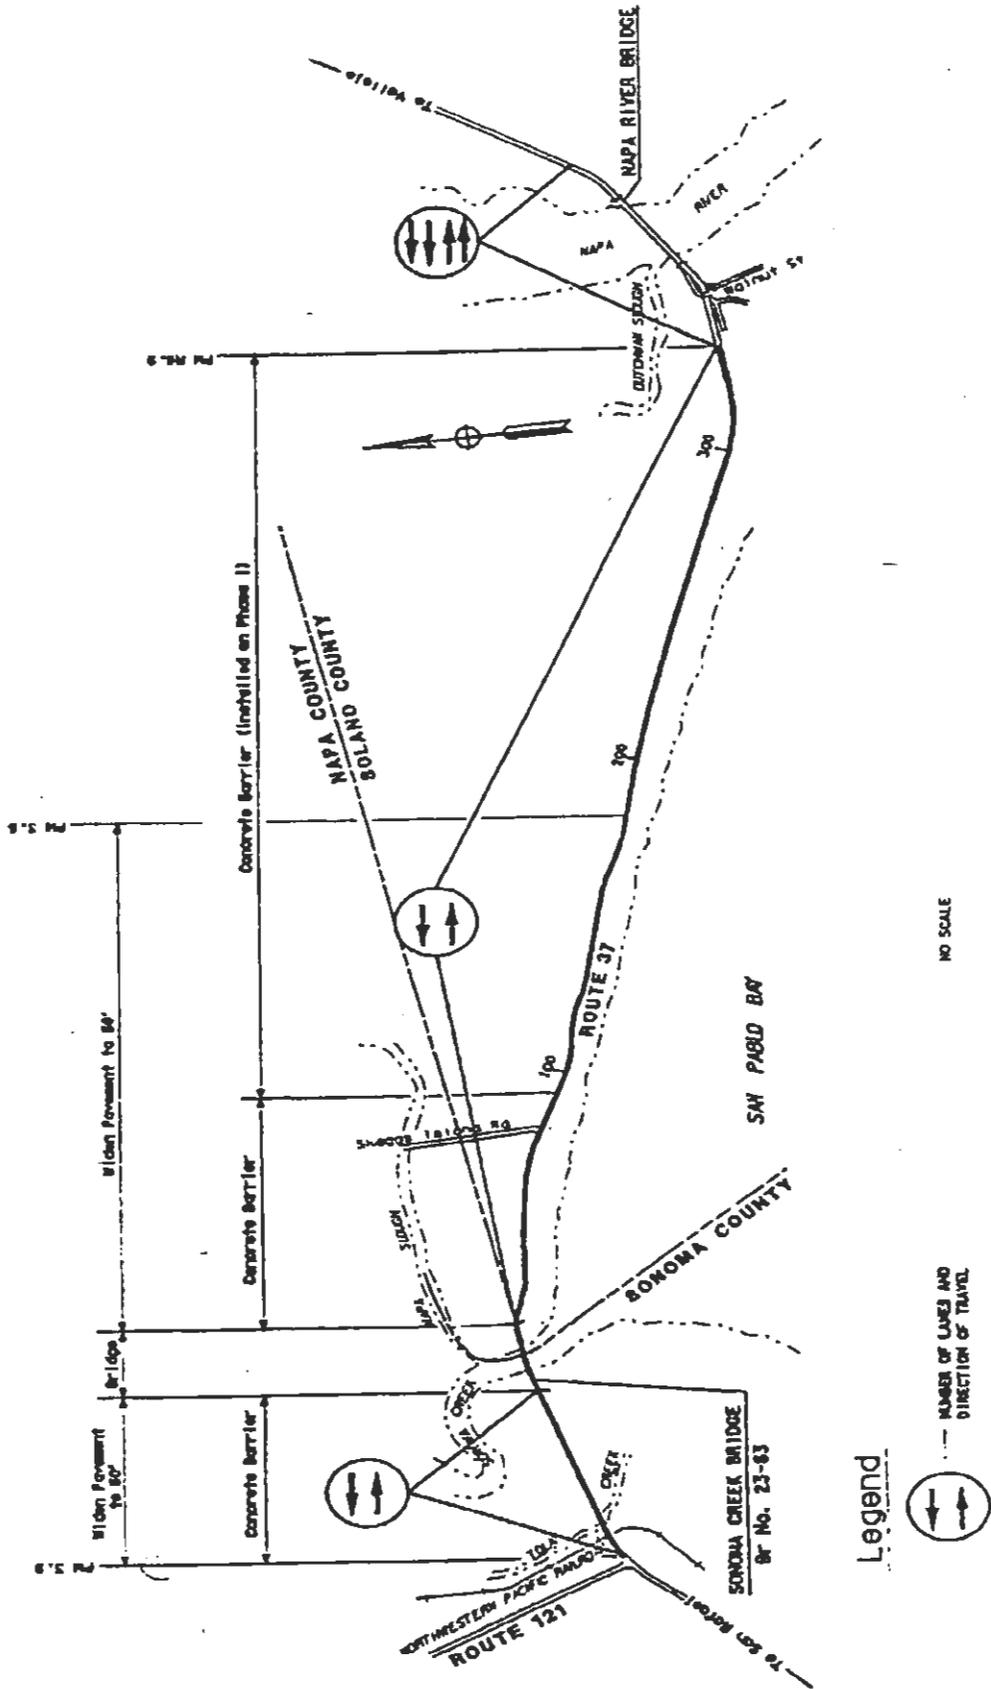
Route 37 Concrete Barrier Demonstration Proposal.
